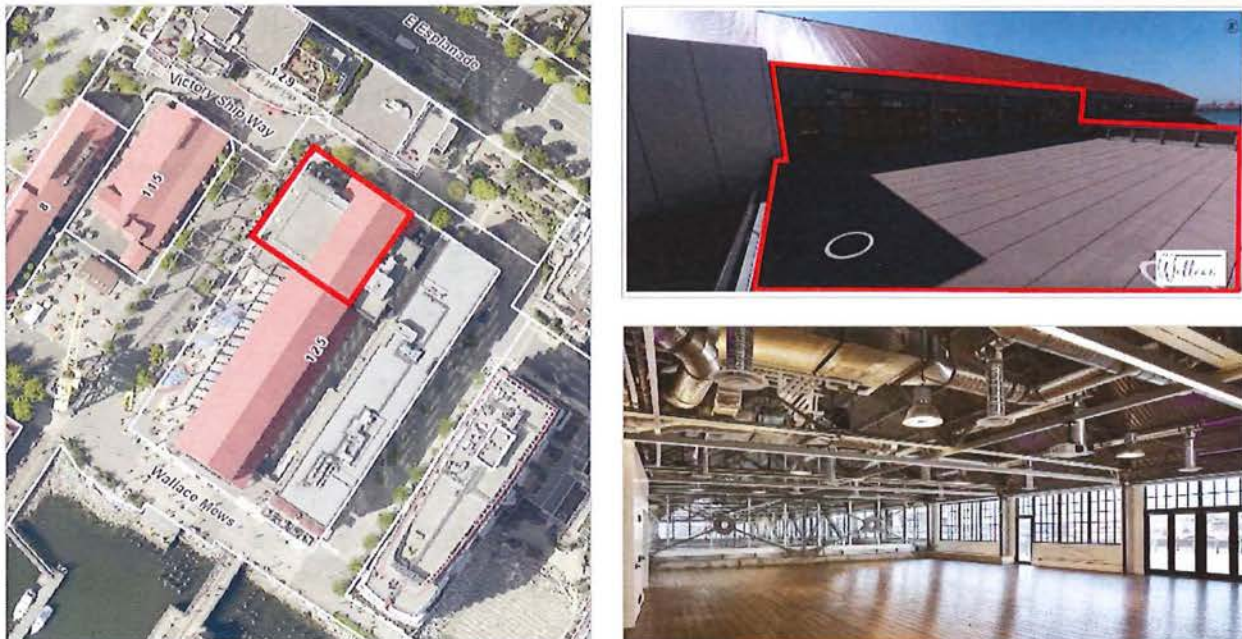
(Left) Site plan depicting subject unit location at third floor; (Right-Top) Photo of exterior terrace; (Right-Bottom) Photo of interior unit space.
